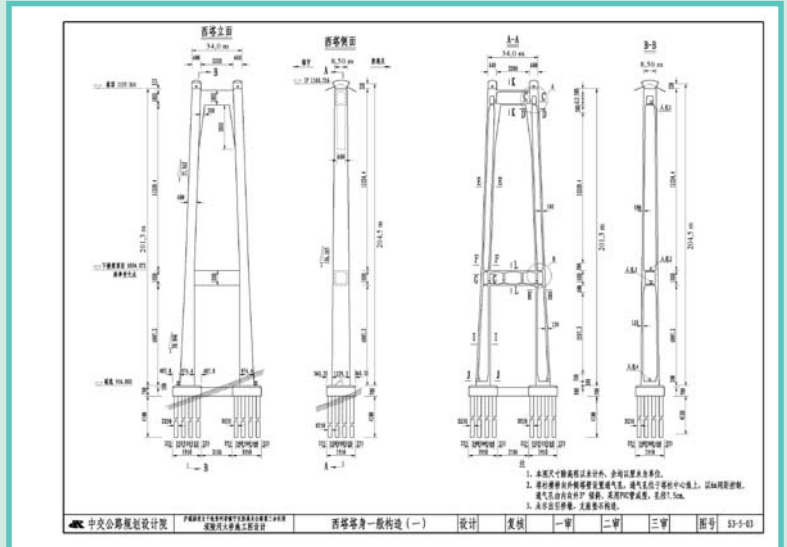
Front and side elevations and vertical cross-sections of the western tower.
